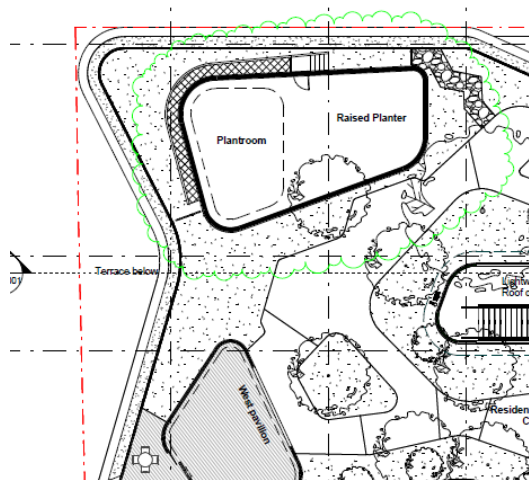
Proposed Plant Room and Raised Planter on Roof Level 09
